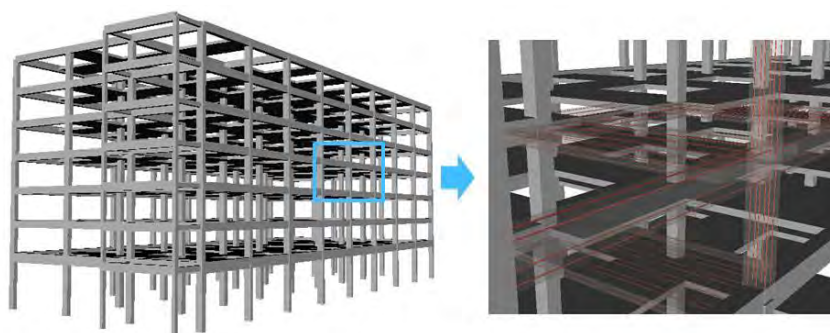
Model of an Existing Reinforced Concrete Frame Building that was Instrumented during the 1994 Northridge Earthquake
